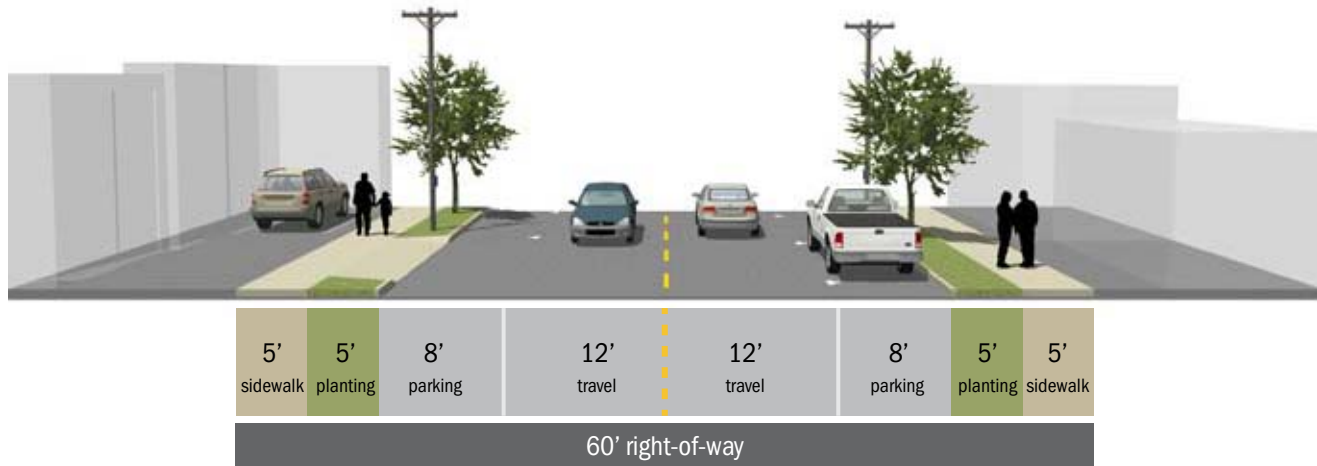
Proposed Conceptual Cross-Section for General Industrial Streets South of Mailwell Drive
